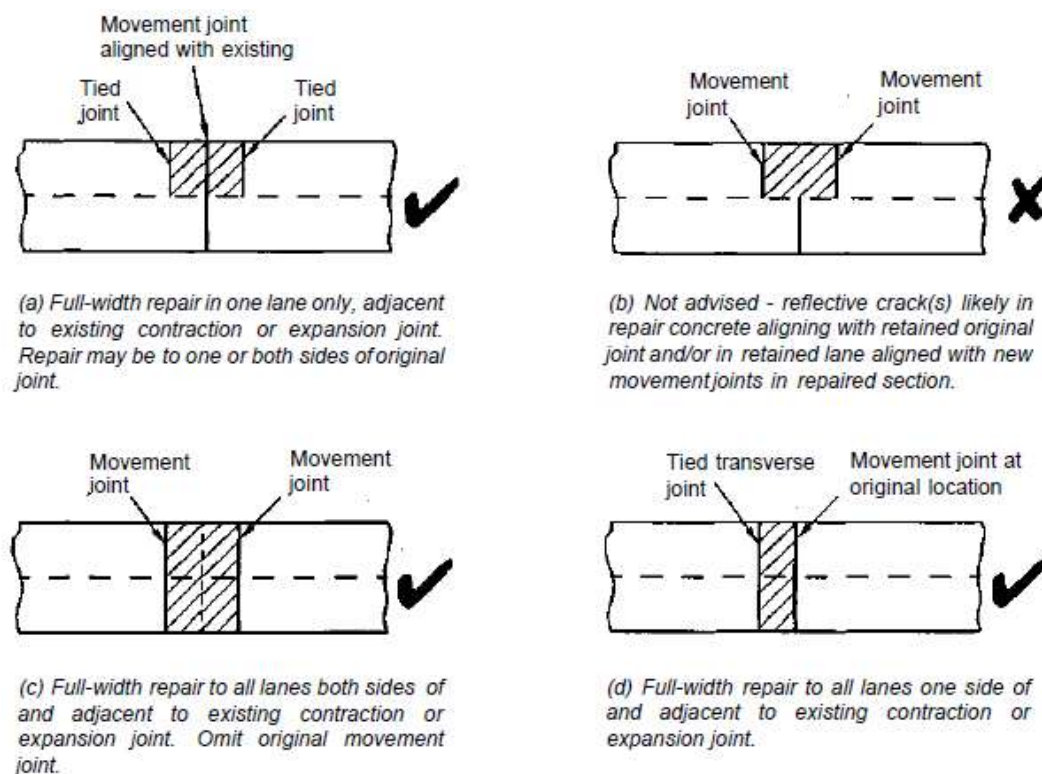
/14- 4 Full-depth repairs to jointed unreinforced concrete (URC) pavements (taken from Figure 8.5 of Concrete Pavement Maintenance Manual, 2001)
